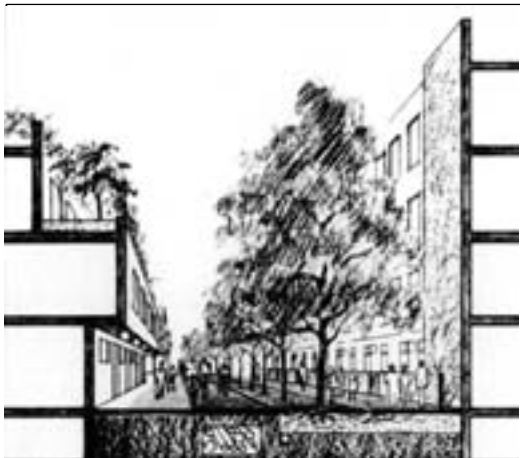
Figure C. Section perspective showing how tree roots can be accommodated on a narrow street retrofitted for pedestrians, bicyclists, and trees. Note large volume of special soil and subsurface drainage.
